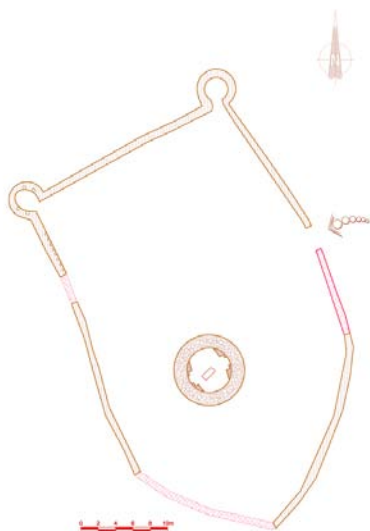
Tepe Qaleh Khalachan, plan of the site.
